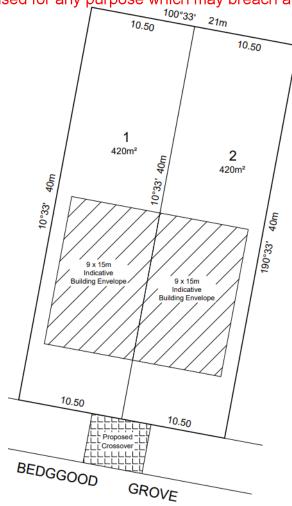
Proposed Plan of Subdivision – Land Surveys
